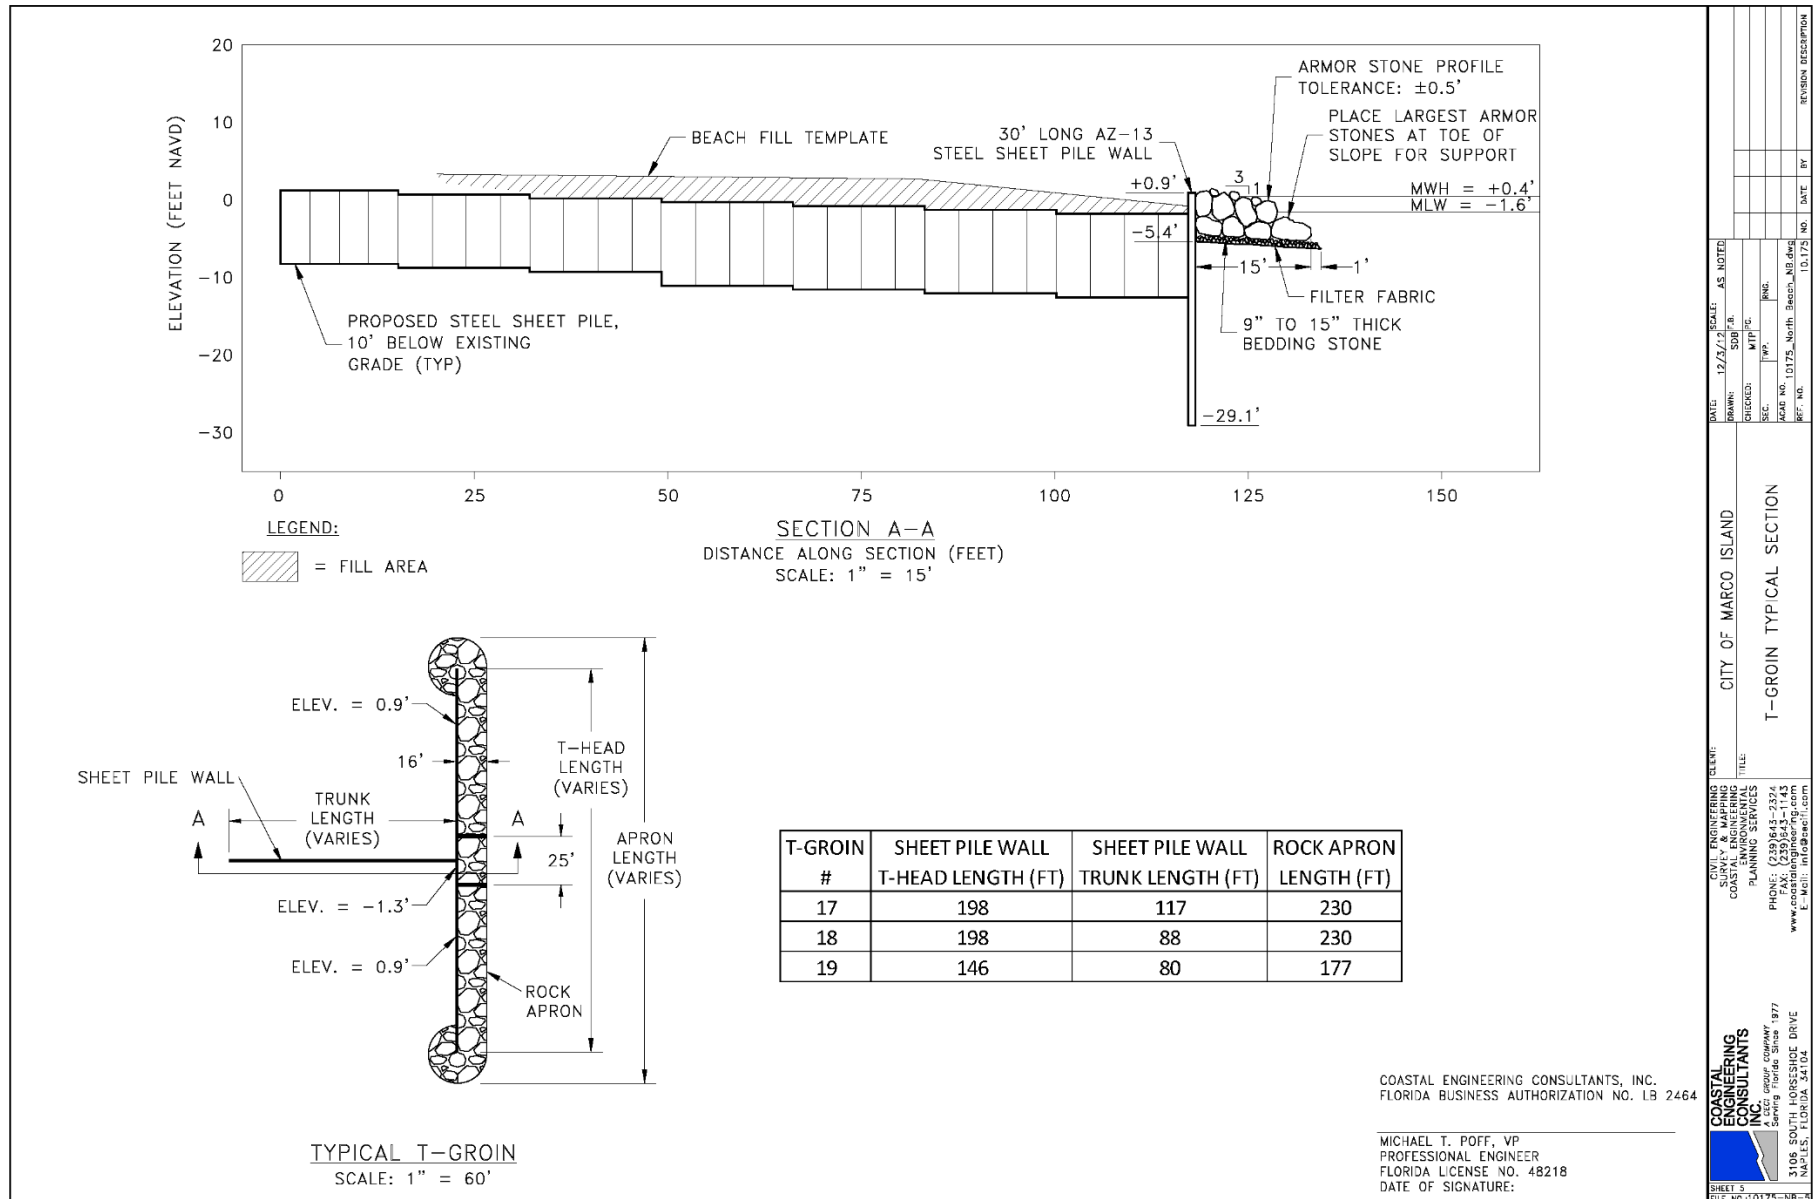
North Beach T-Groin Typical Plan and Profile Views
